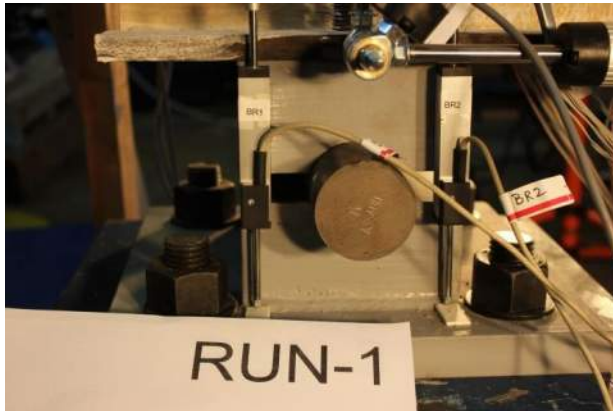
Damaged Girder Bearing: 8 kip
